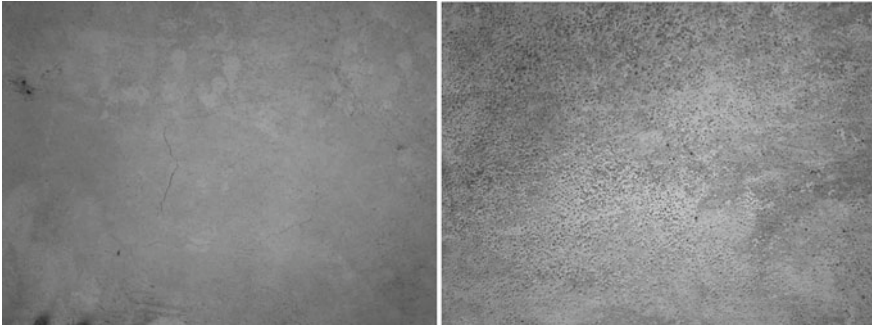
Drying shrinkage crack on normal Grade 40 MPa concrete with granite aggregates (left), no crack on Grade 40 MPa lightweight concrete (right)
